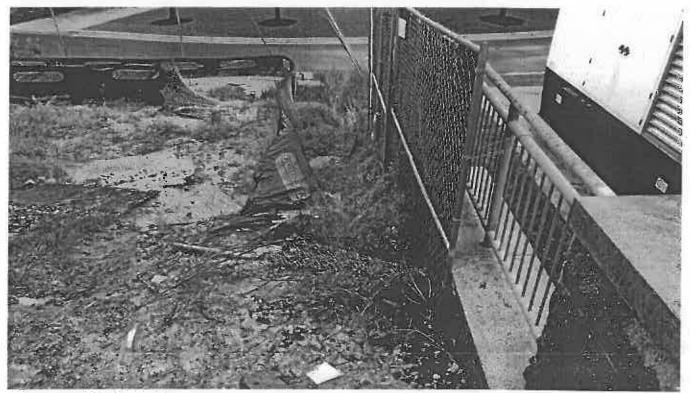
Unmaintained E and S controls at the Slope of the Tunnel Project North of the Site
